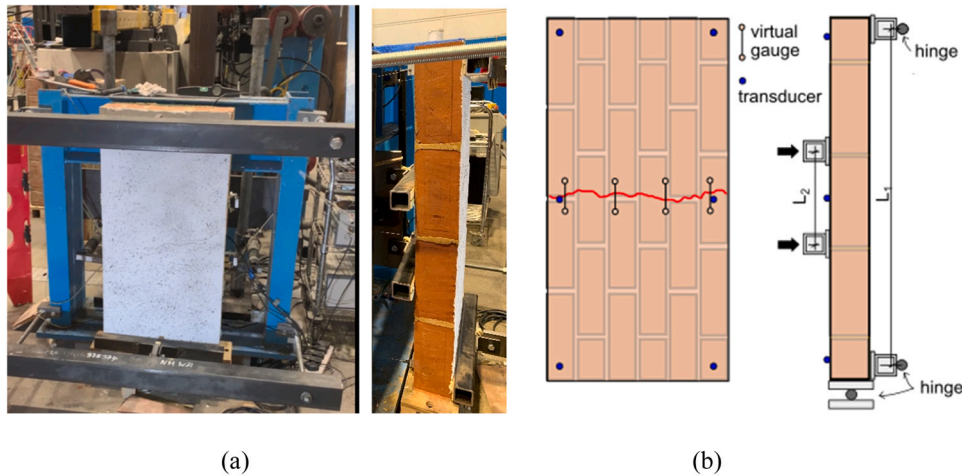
Bending perpendicular tests: (a) testing arrangement, and (b) schematic representation.
